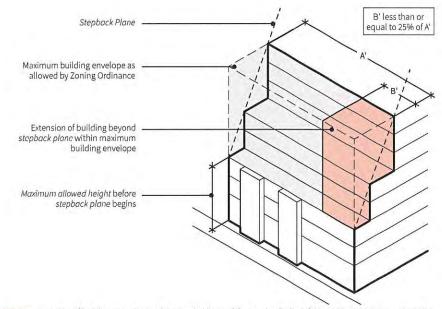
A portion of building massing can be extended beyond the stepback plane if it is within the maximum building envelope and is not greater than 25 percent of the total building frontage.
